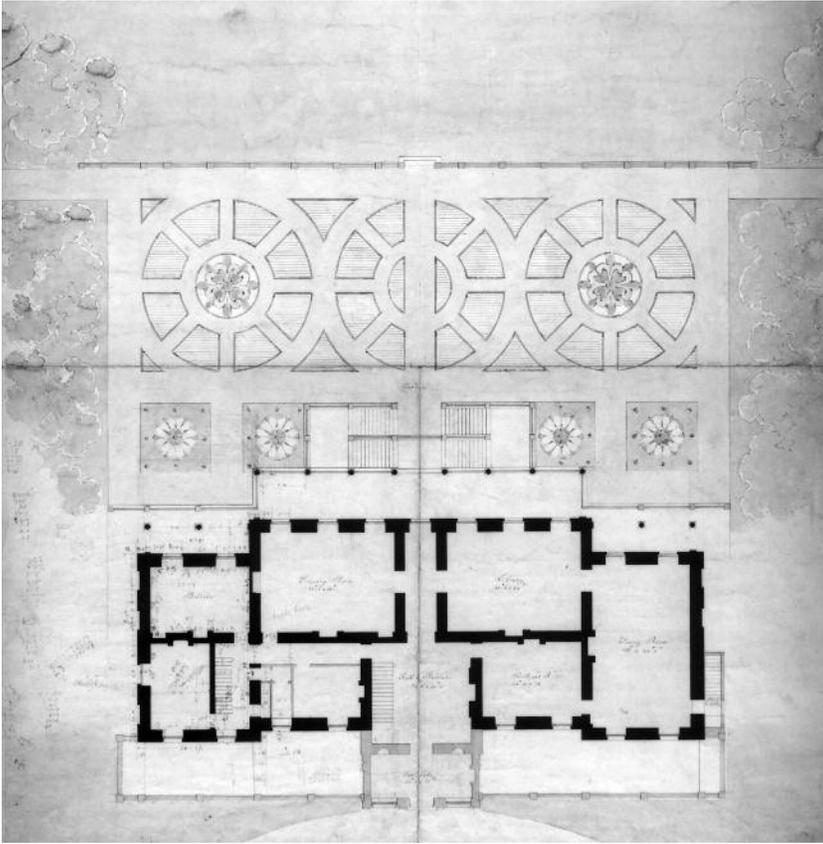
Alexander Roos, Dale Park, proposal plan of basement and garden, c.1844.
